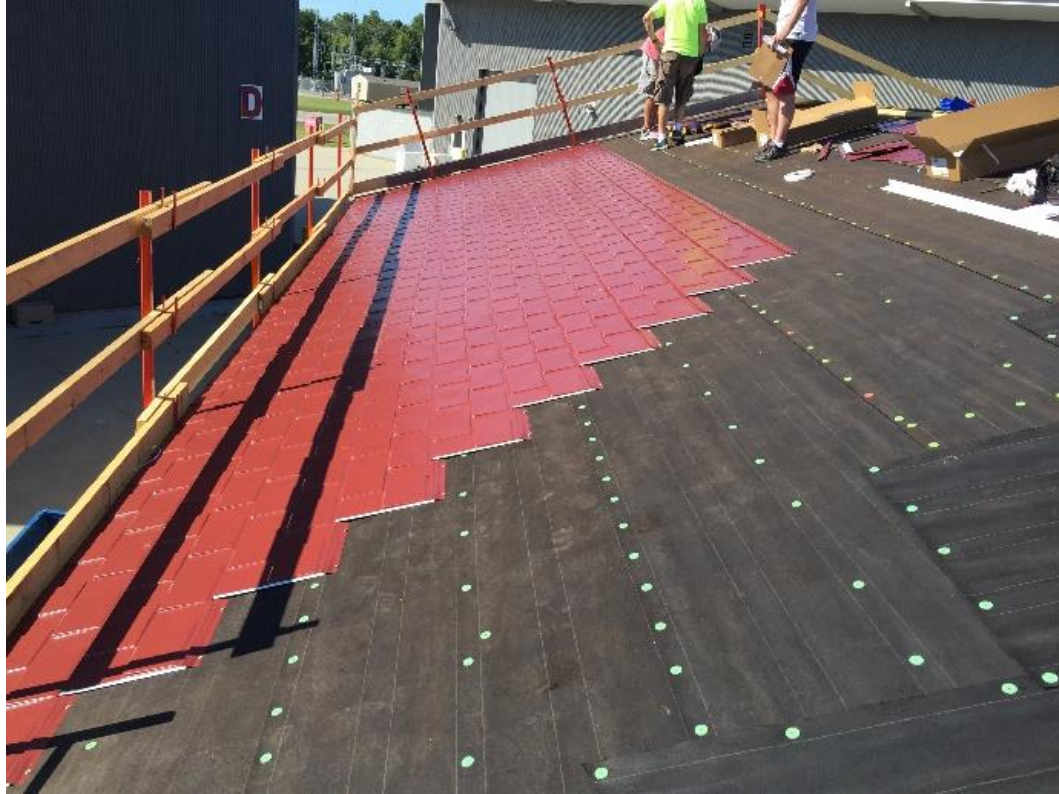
Photograph of the installation of the metal shingles on the test building at IBHS.
